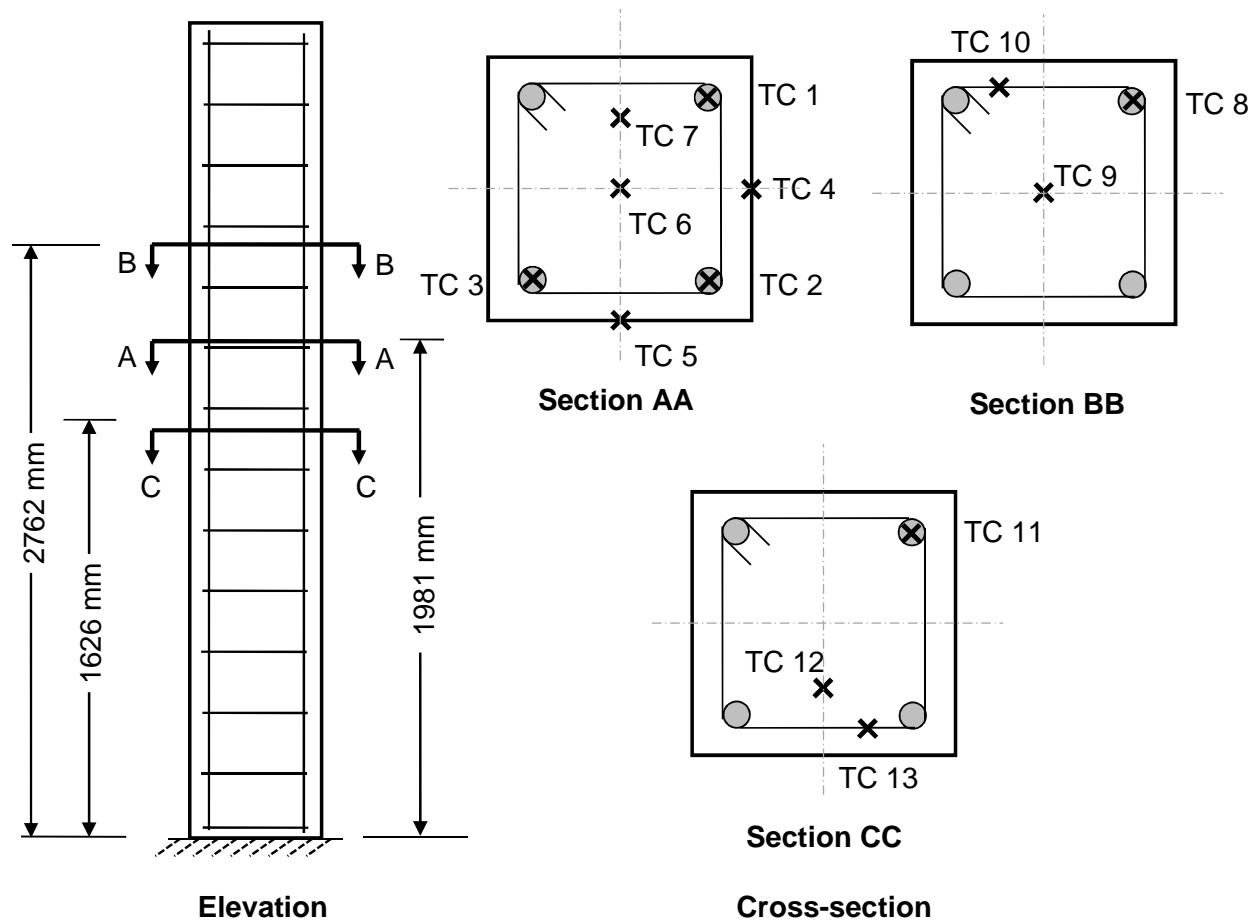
Column cross-section showing location of thermocouples (TCs)
